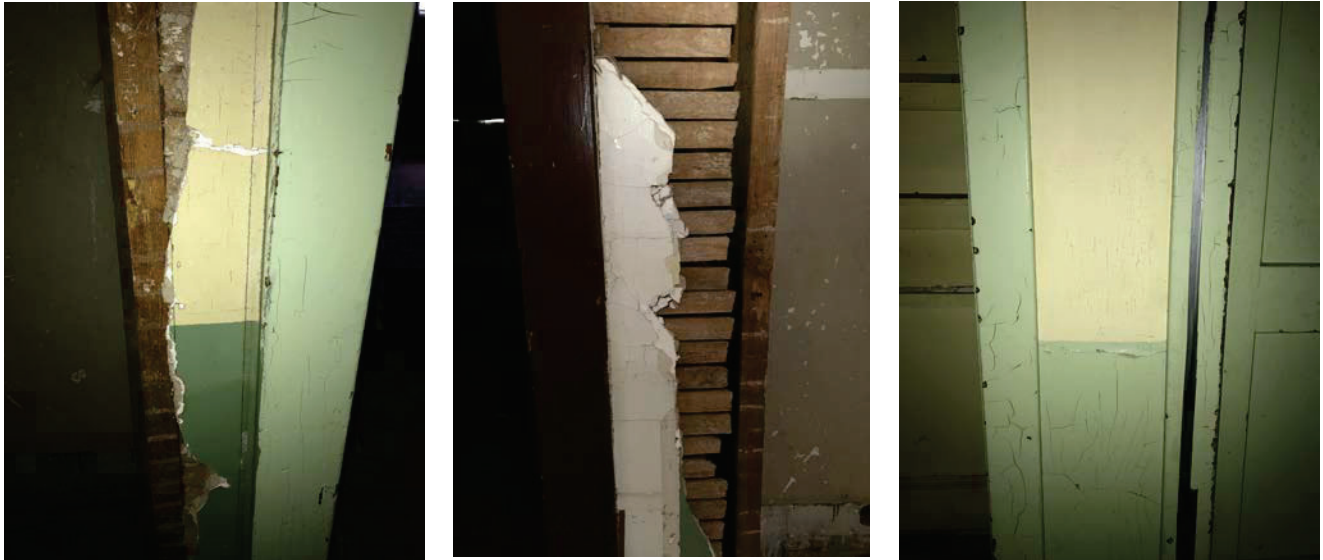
White, mint green, cream and green paint on the plaster in the 1st and 2nd floor hallway
